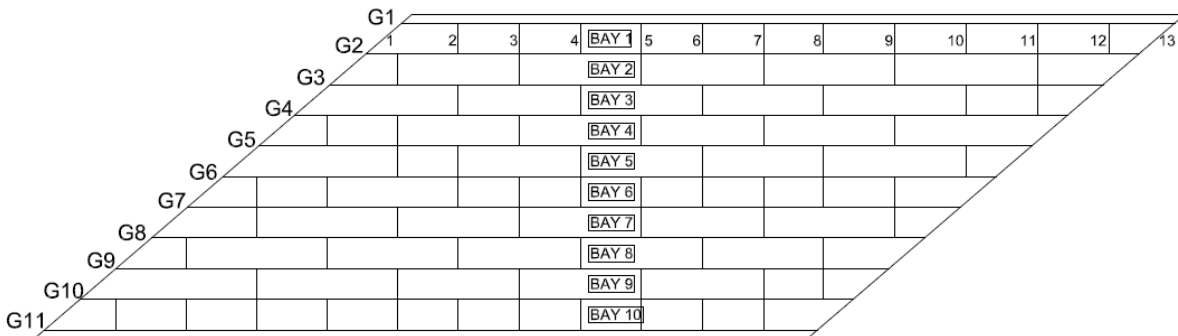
Girder, bay, and cross-frame numbering for Bridge 2.
